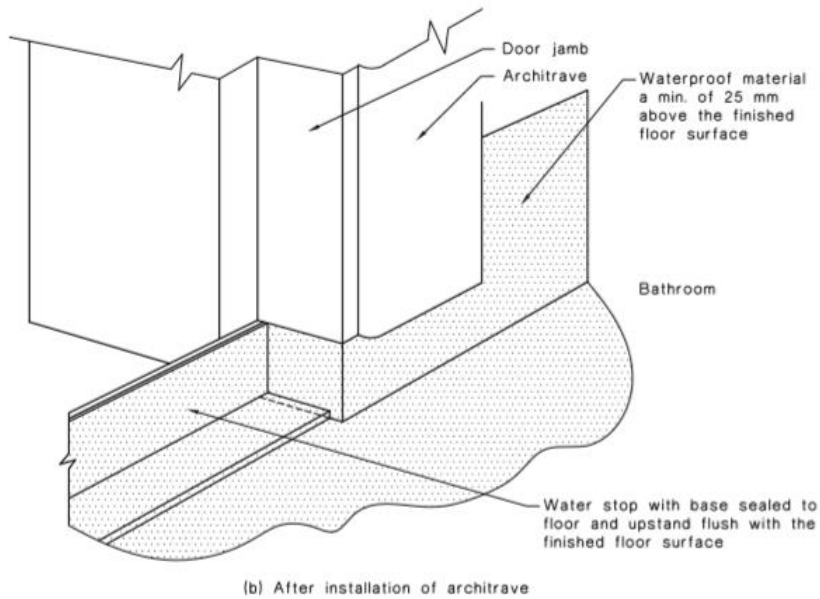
TYPICAL BATHROOM DOOR DETAIL FOR WHOLE BATHROOM WATERPROOFING
